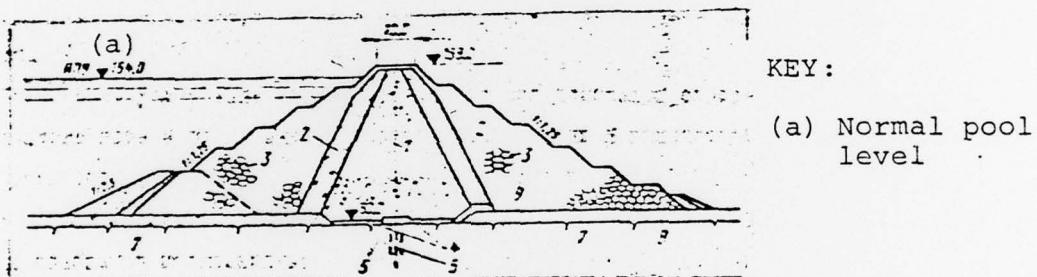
Earth-rock dam at the Serebryansk hydroelectric power plant on the Voronya River. (1) Core from sandy-loam moraine; (2) sandy-gravelly soil; (3) rockfill; (4) clay; (5) concrete slab; (6) grout curtain; (7) granites; (8) morainal crushed stone; (9) crushed stone.
